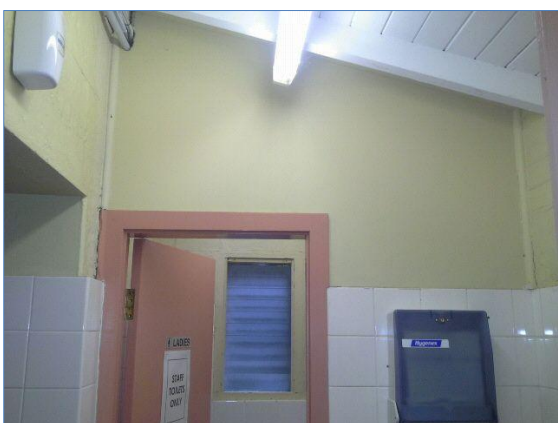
Ground floor - Cream paint to walls, Pink paint to doors frames, windows and skirting boards
